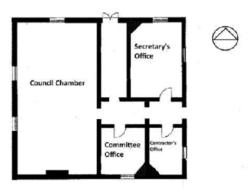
Indicative floor plan of original Shire Hall in 1876-77. Source: David Rowe.
